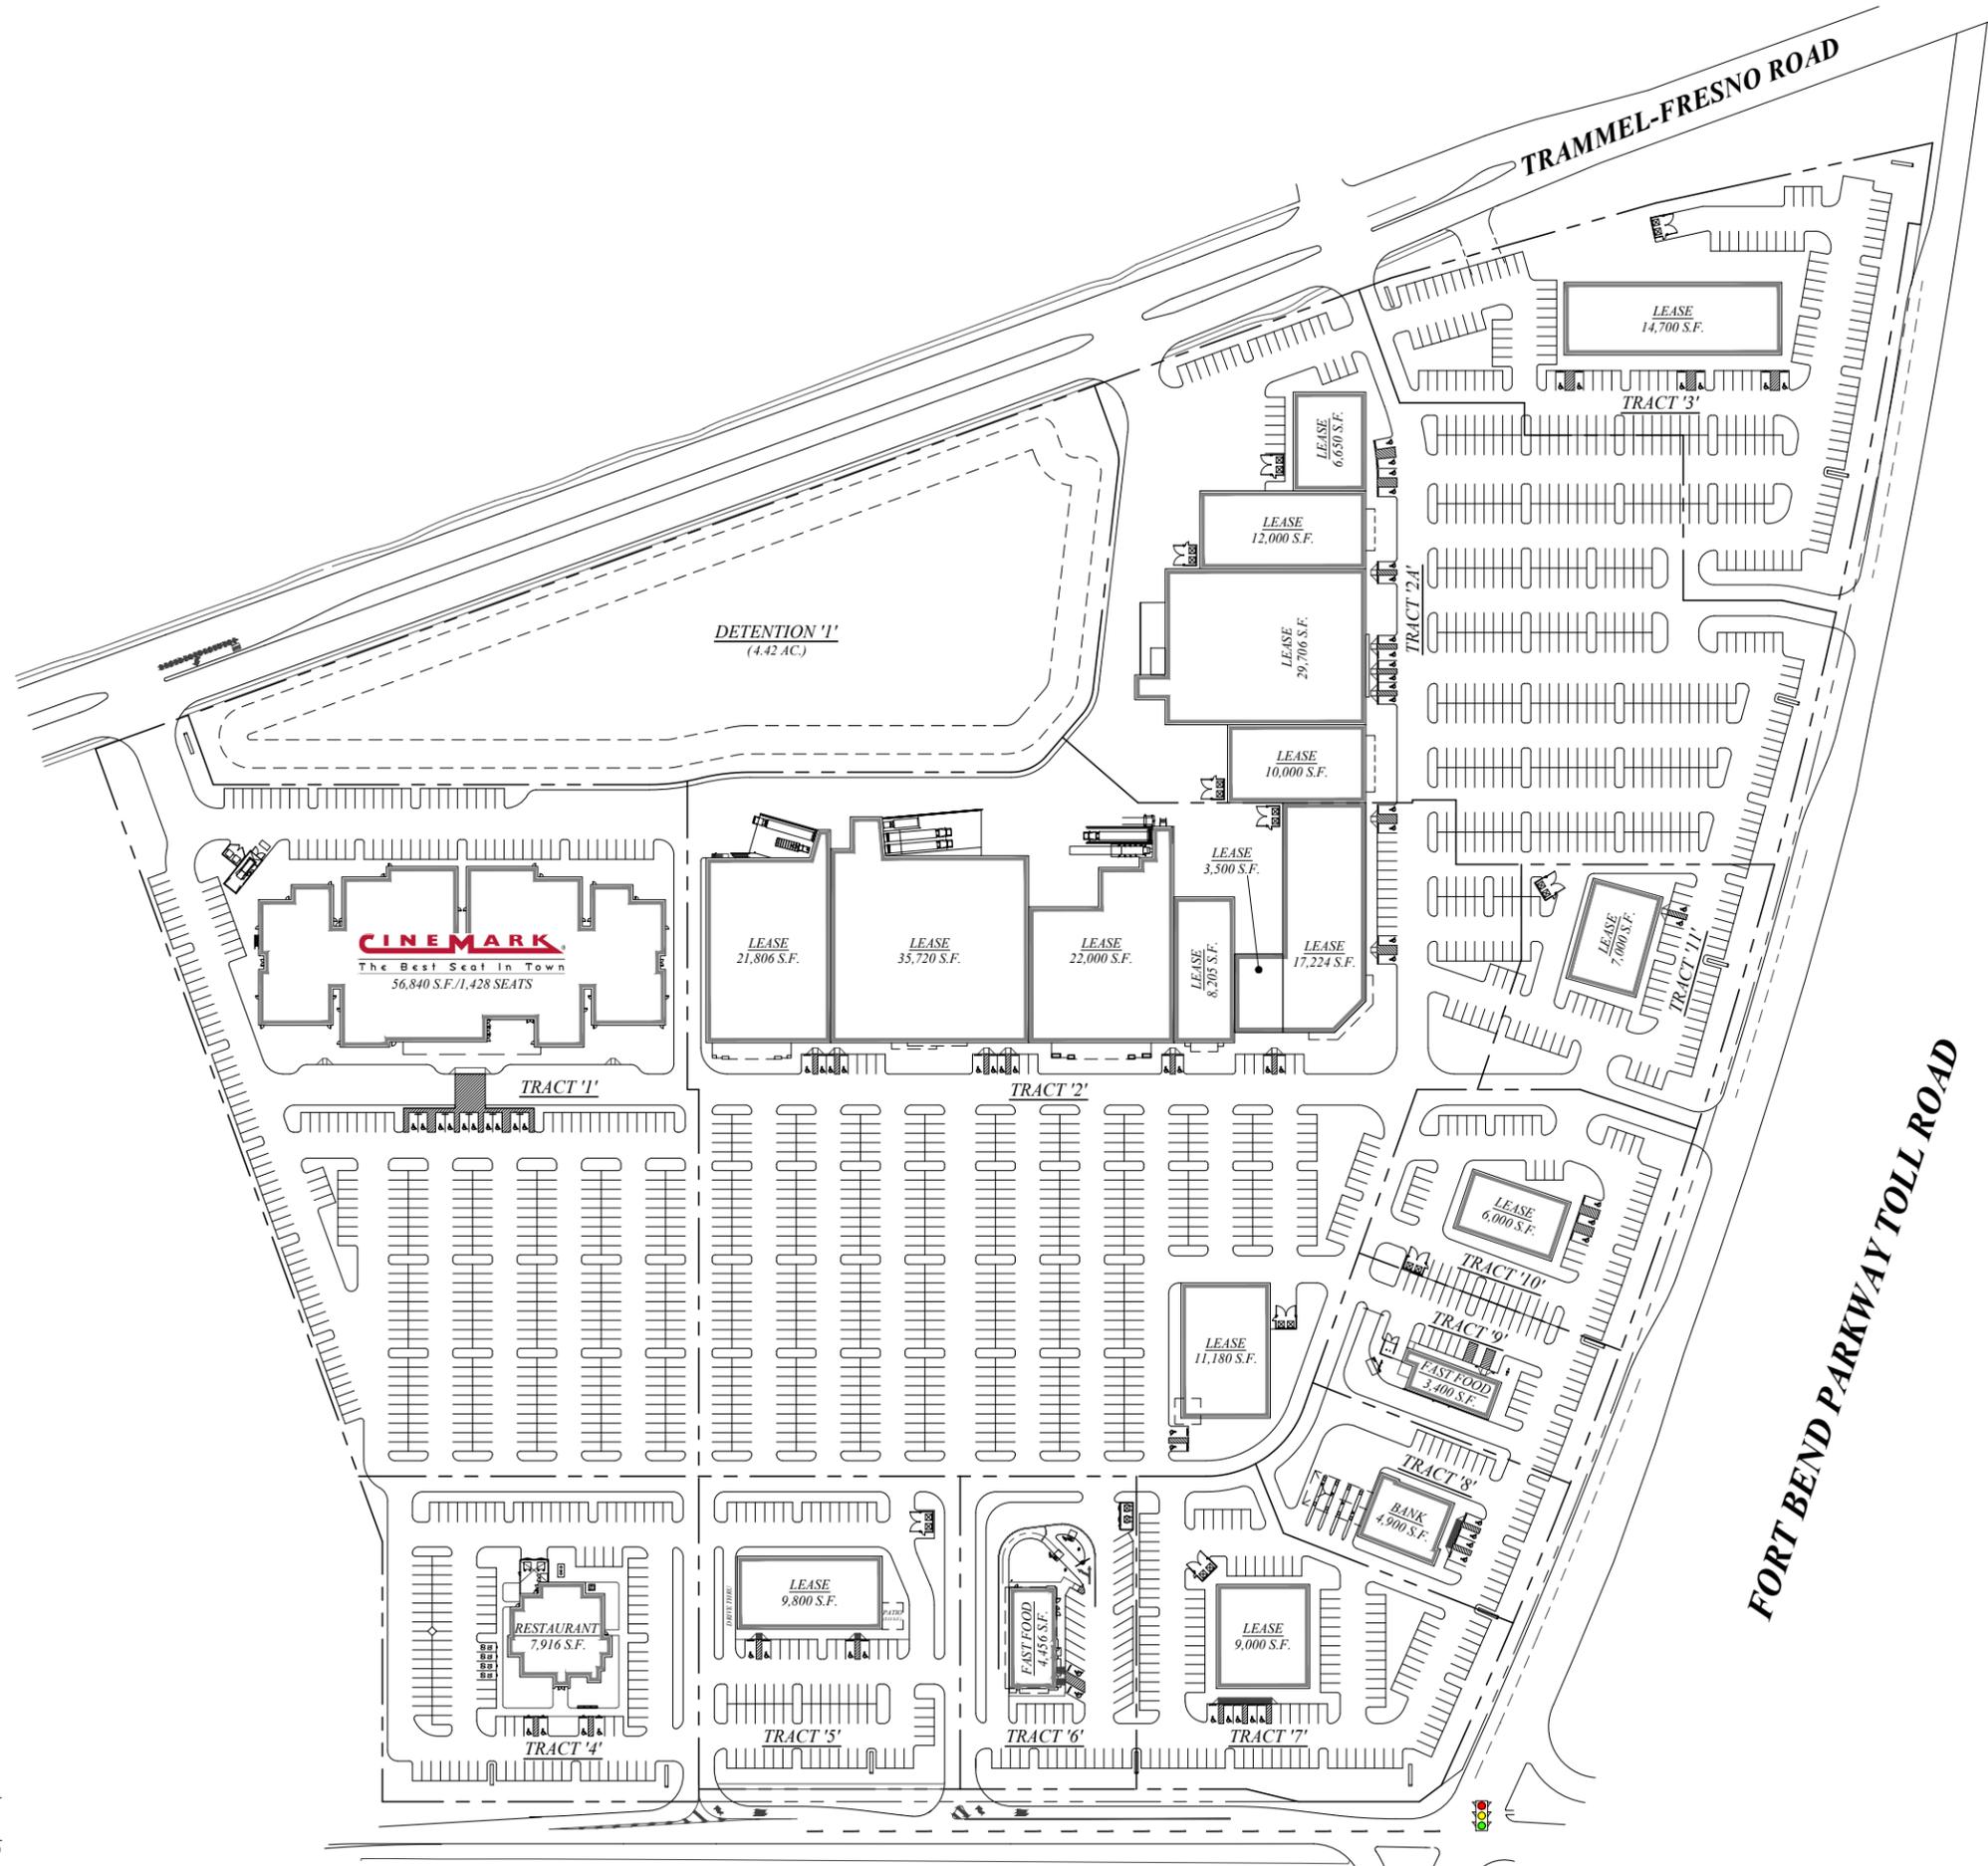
EXHIBIT C - POTENTIAL ADDITIONAL TRACT
